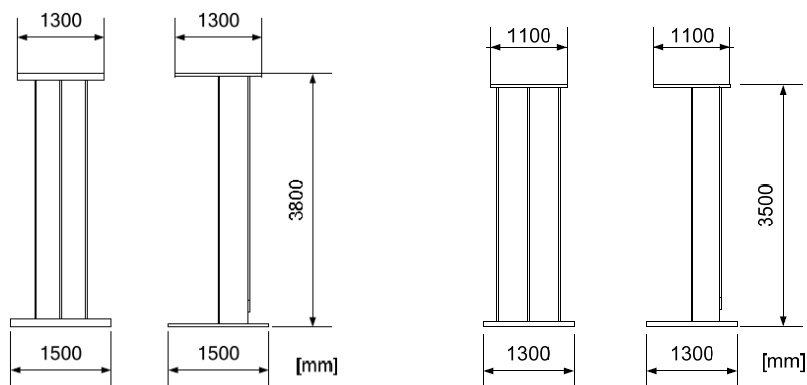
Detailing of main girders' cross-sections (S355 and S690, respectively) (source: OPTIBRI [5]).
